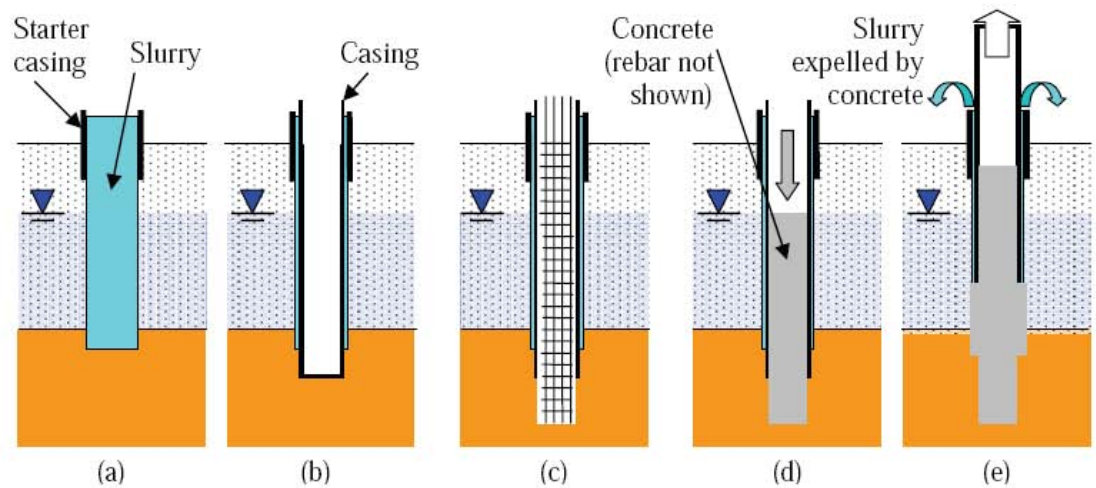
Construction Using Casing Through Slurry-Filled Starter Hole: (a) drill with slurry; (b) set casing and bail slurry; (c) complete and clean excavation, set reinforcing; (d) place concrete to head greater than external water pressure; (e) pull casing while adding concrete
